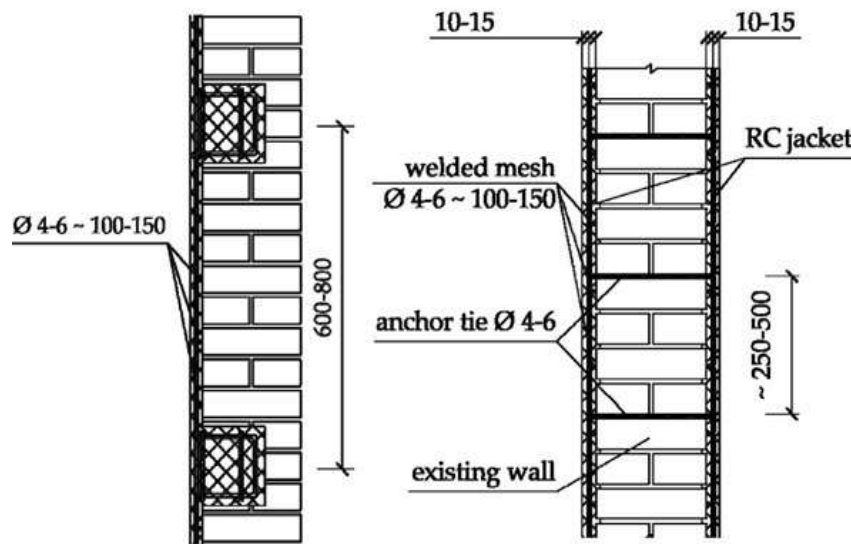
Strengthening of Masonry Walls by Application of Single and Double sided reinforced concrete (RC) jackets
